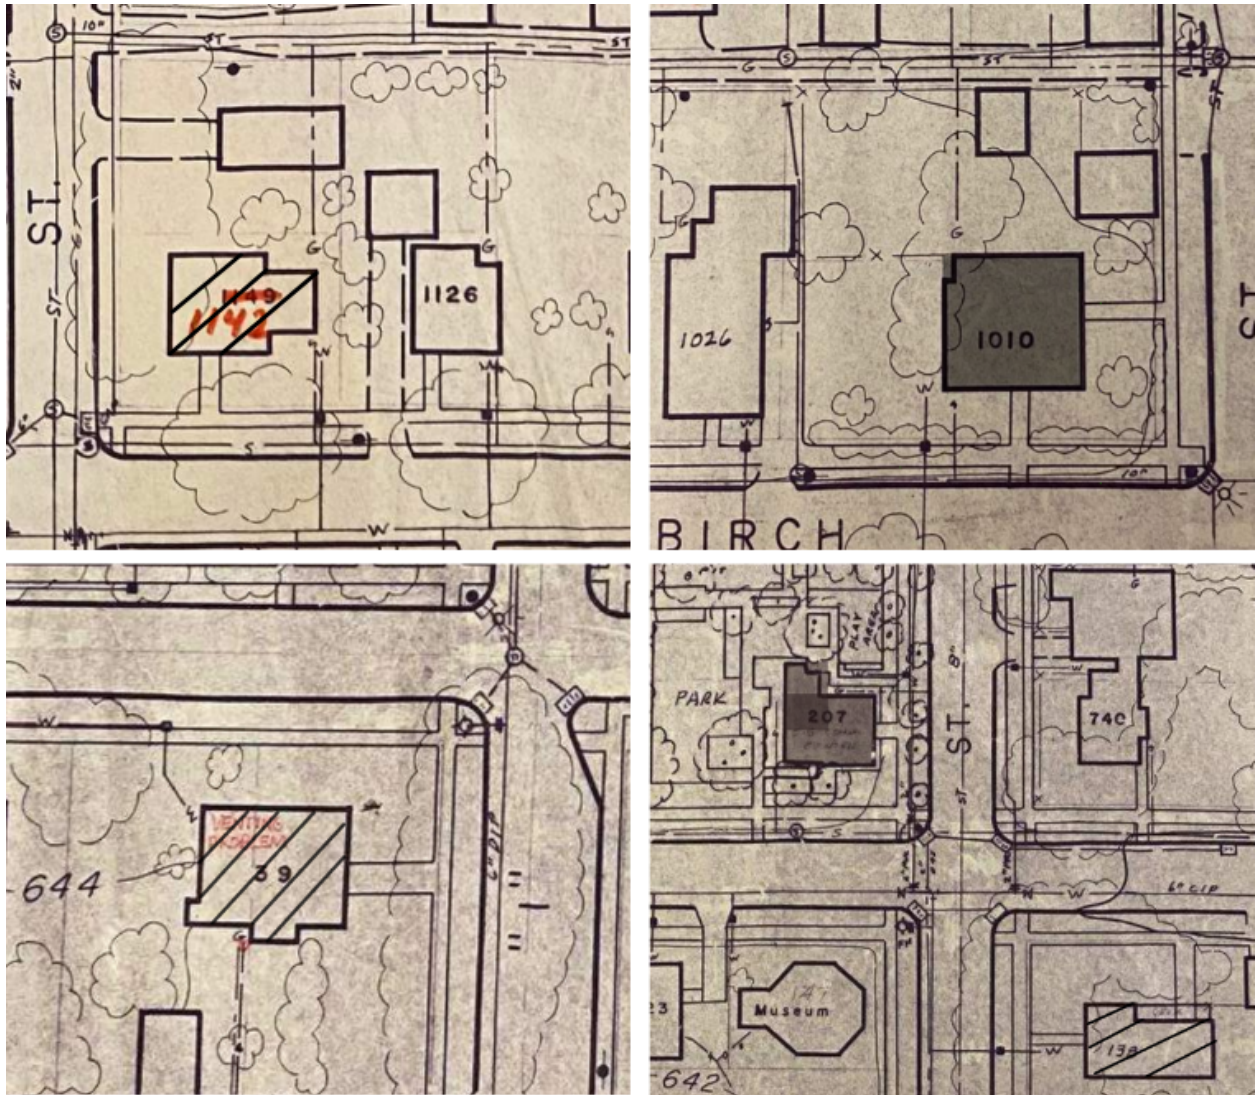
Survey Map, annotated. 1985 building footprint map. Clockwise from top left: 1142 Ash Avenue, 1010 Birch Avenue, 207 H Street, 138 H Street and 39 I Street.
